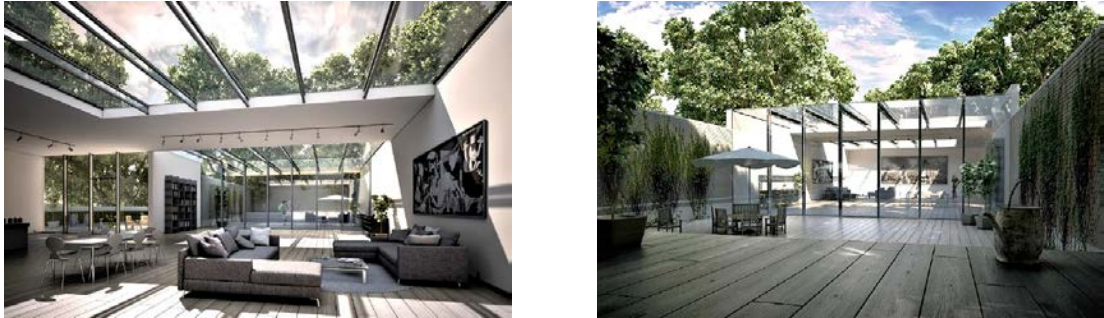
Timber-glass composite beams as structural members of roof structure and conservatory (architectural visualizations).
